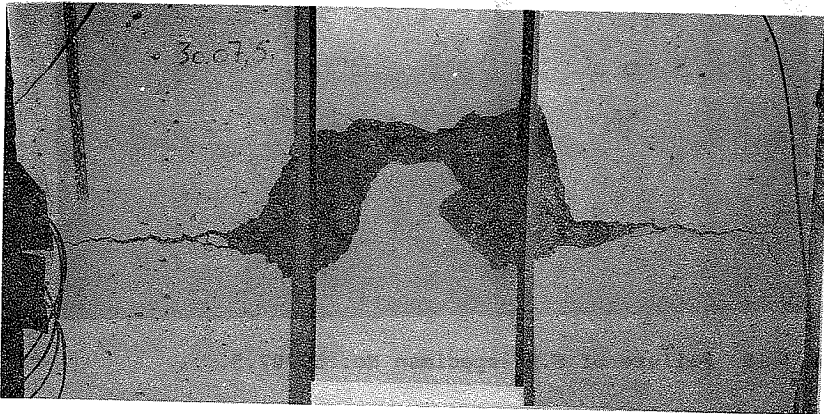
Failure of S.B.-specimen No. 30/07.5.
